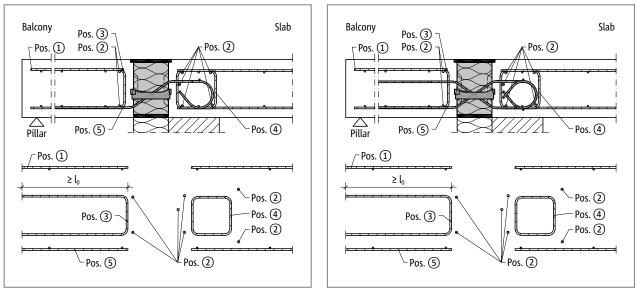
Schöck Isokorb® XT type Q-V1 to V4: On-site reinforcement
